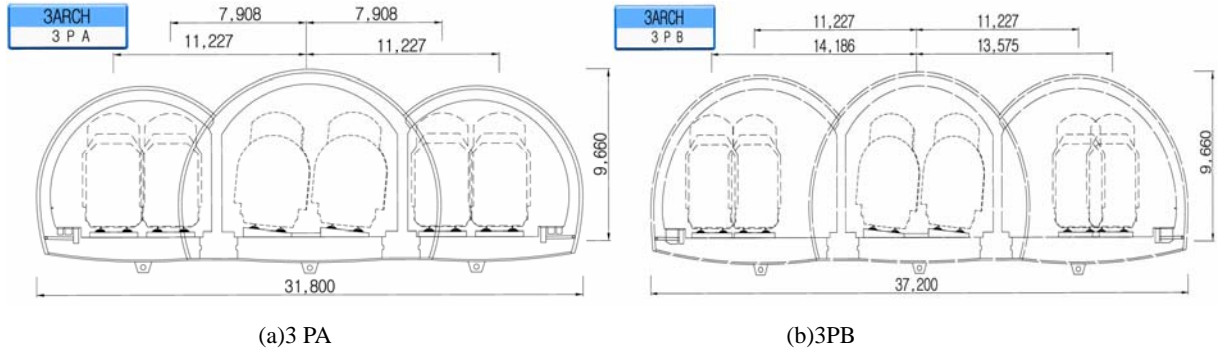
Standard cross-section of modified 3-Arch tunnel of Seong-Nam Station
